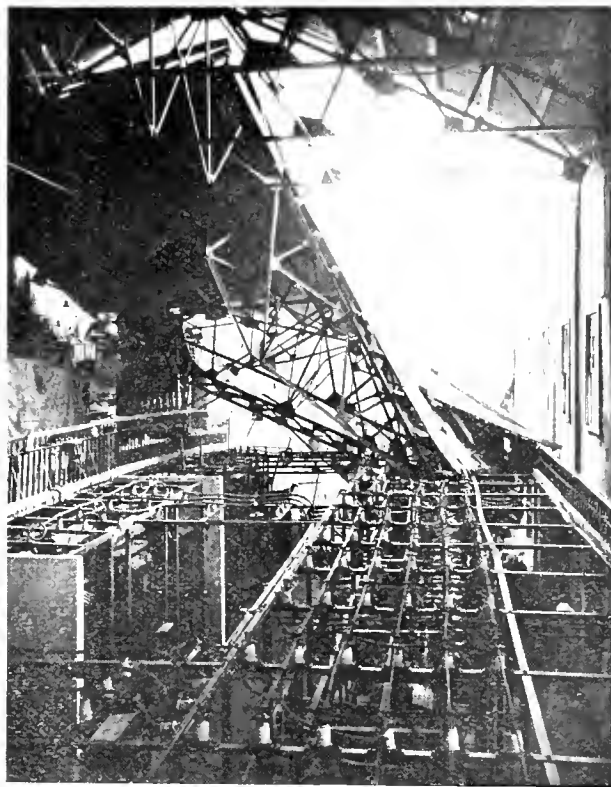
Nakamoto substation-view looking towards front of station taken just above mezzanine floor level
